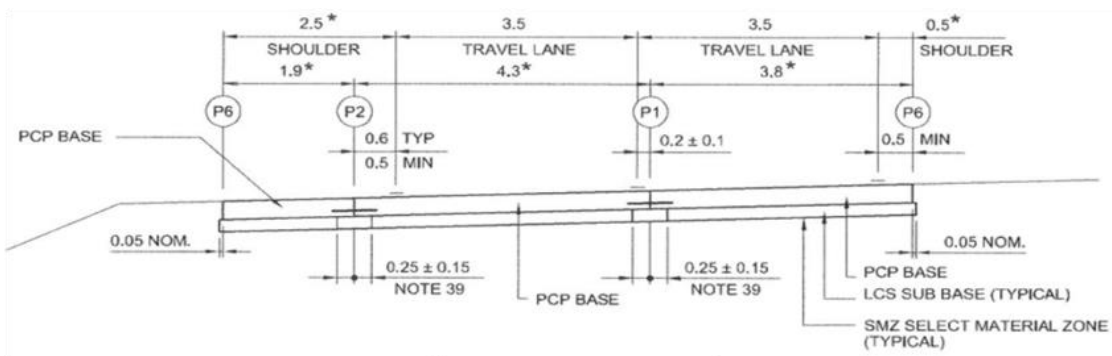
(b) Contemporary two-lane carriageway with selected material zone. Typical 2-lane concrete pavement carriageways with concrete shoulder
